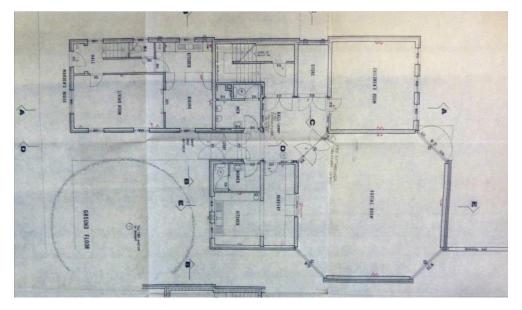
Ground floor layout shown on the architects' plans (Chesterfield meeting collection)
